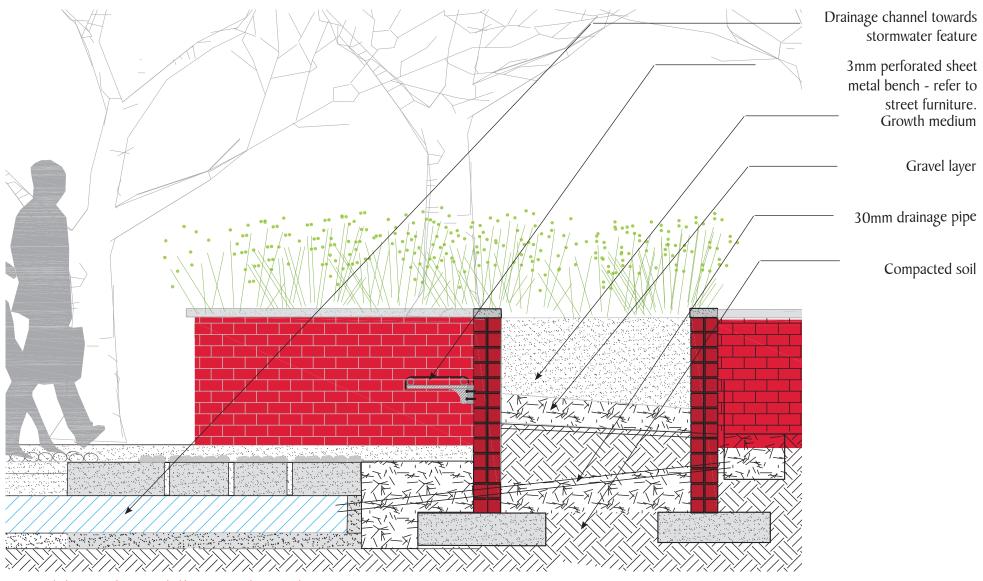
Plinth to Main Administration building Section Scale 1:25 (Author, 2008)
